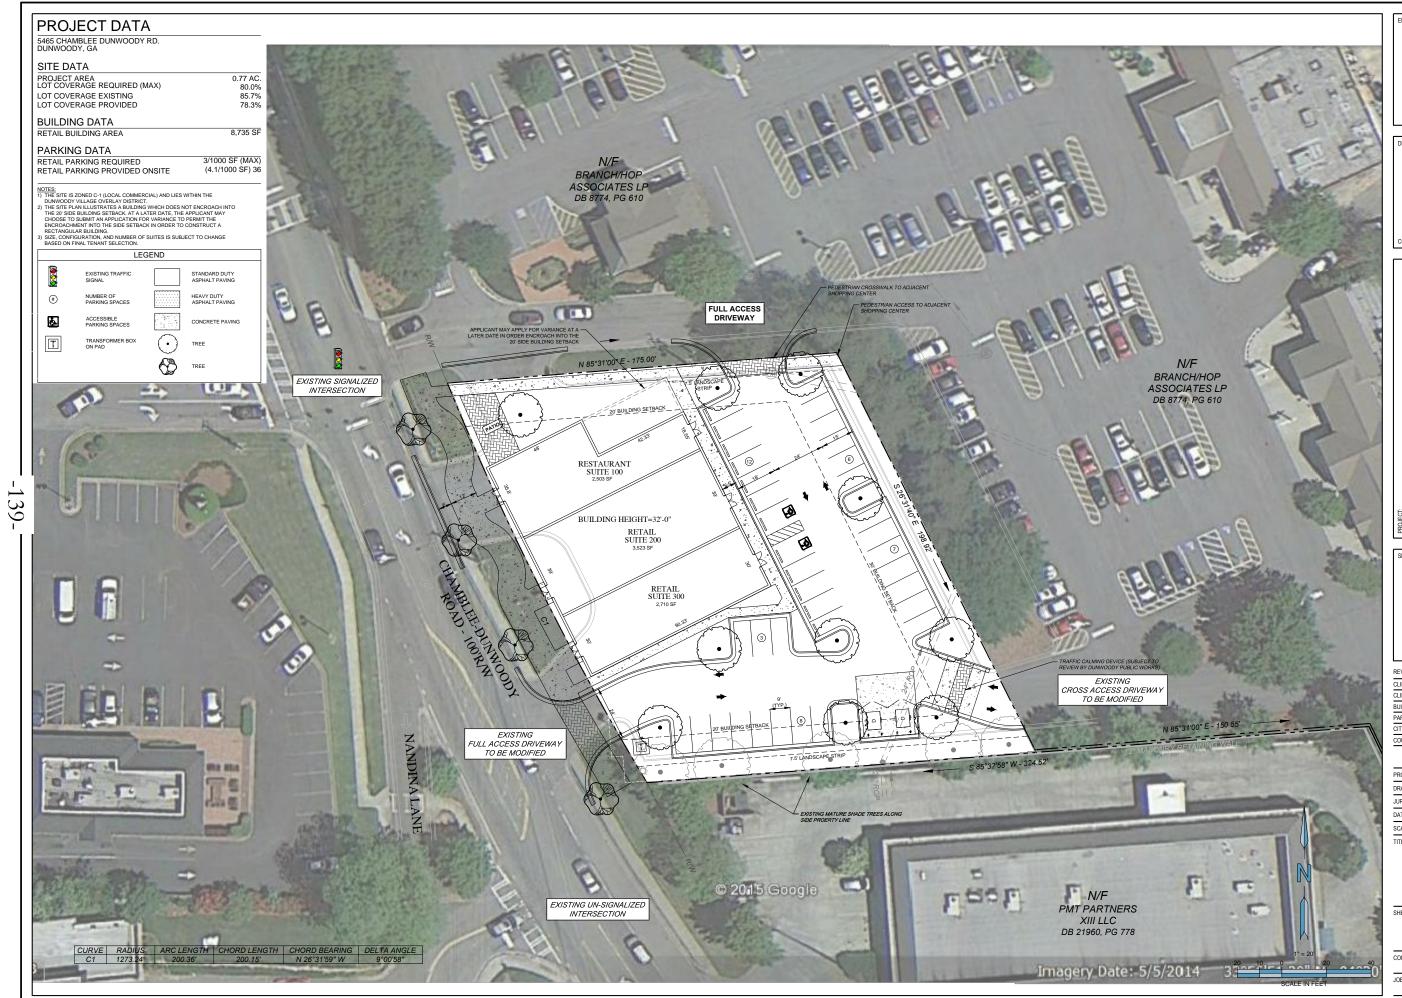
EXHIBIT A: Site plan, completed by Forsite Group, received March 1, 2017. EXHIBIT B: Building Elevations, completed by Max Design Group, dated February 15, 2017.
